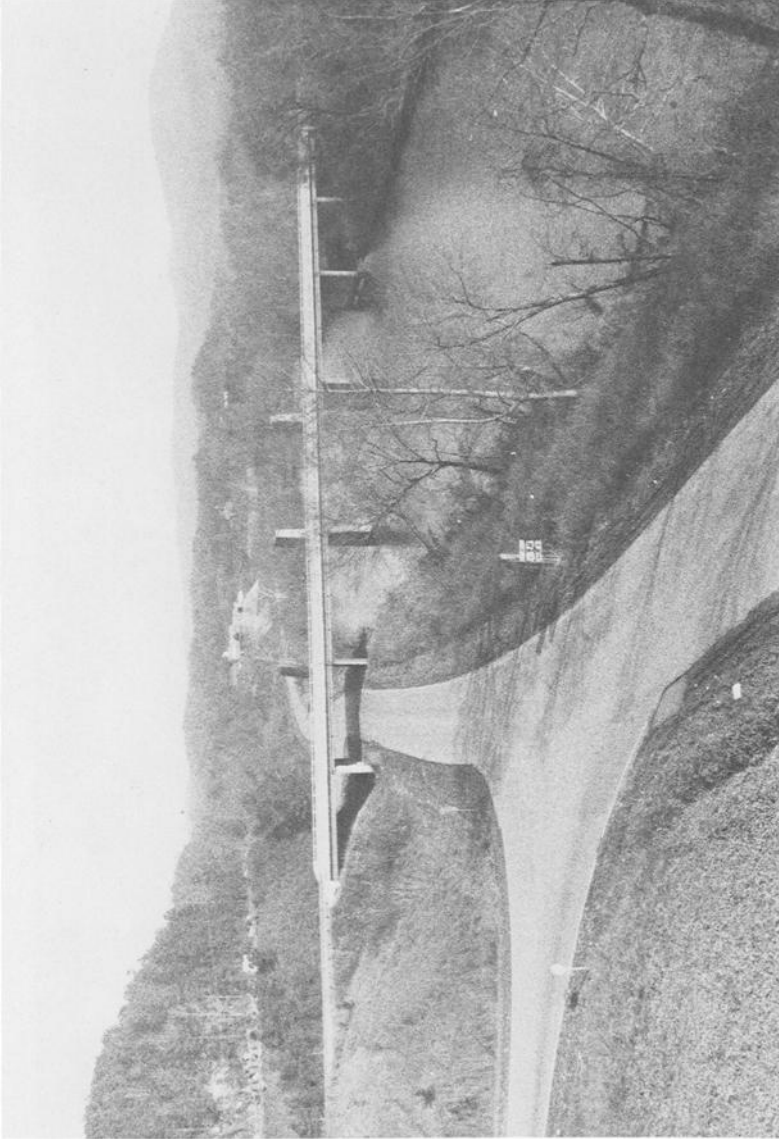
Modern view of the remains of the Etowah railroad bridge. Because of the presence of Louisville and Nashville Railroad, camera position is closer to bridge and higher than that in Fig. 8. Bridge piers behind modern highway bridge are the only remains of the Civil War era bridge.
